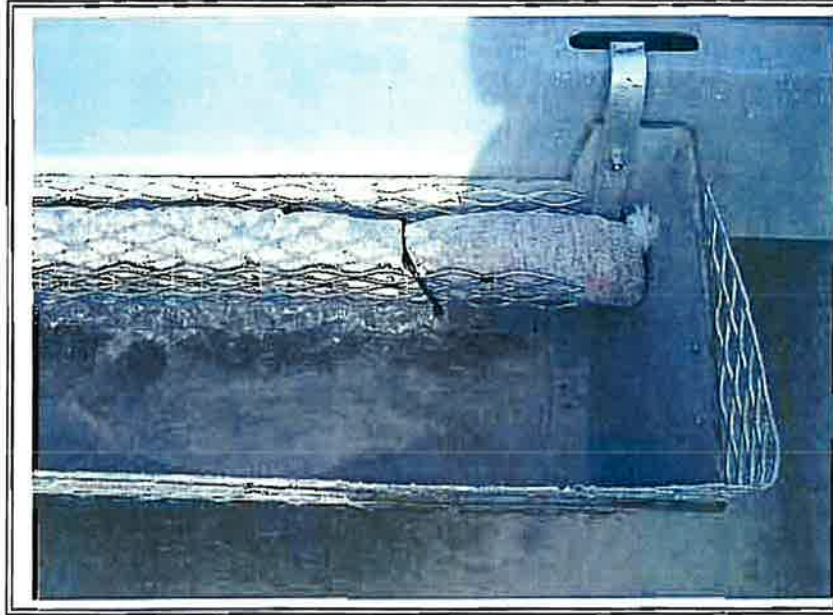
Curb Inlet hook hanging in slot on test bed
